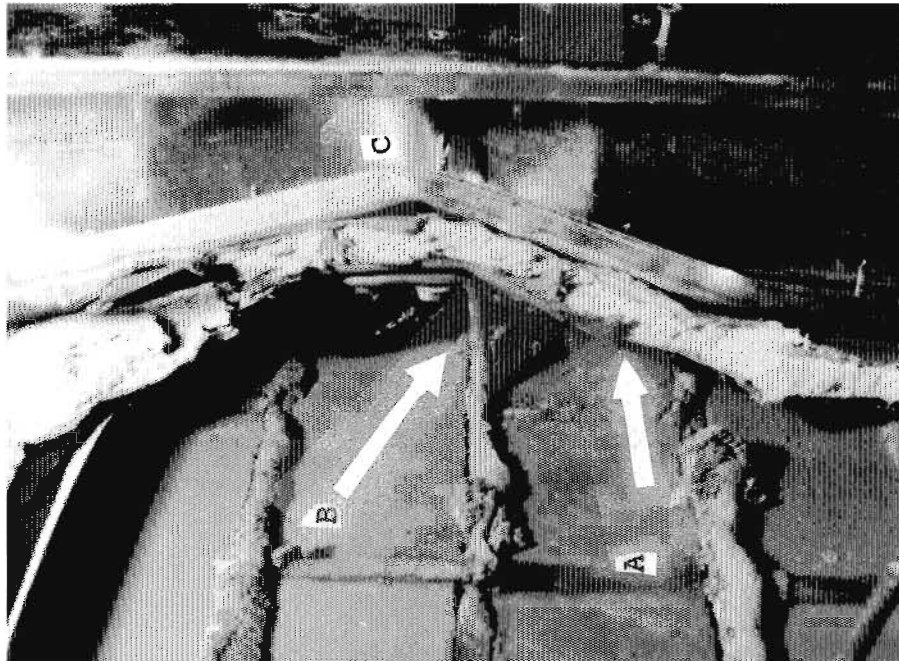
STEEL STUD FLEXURAL FAILURE - WALL
